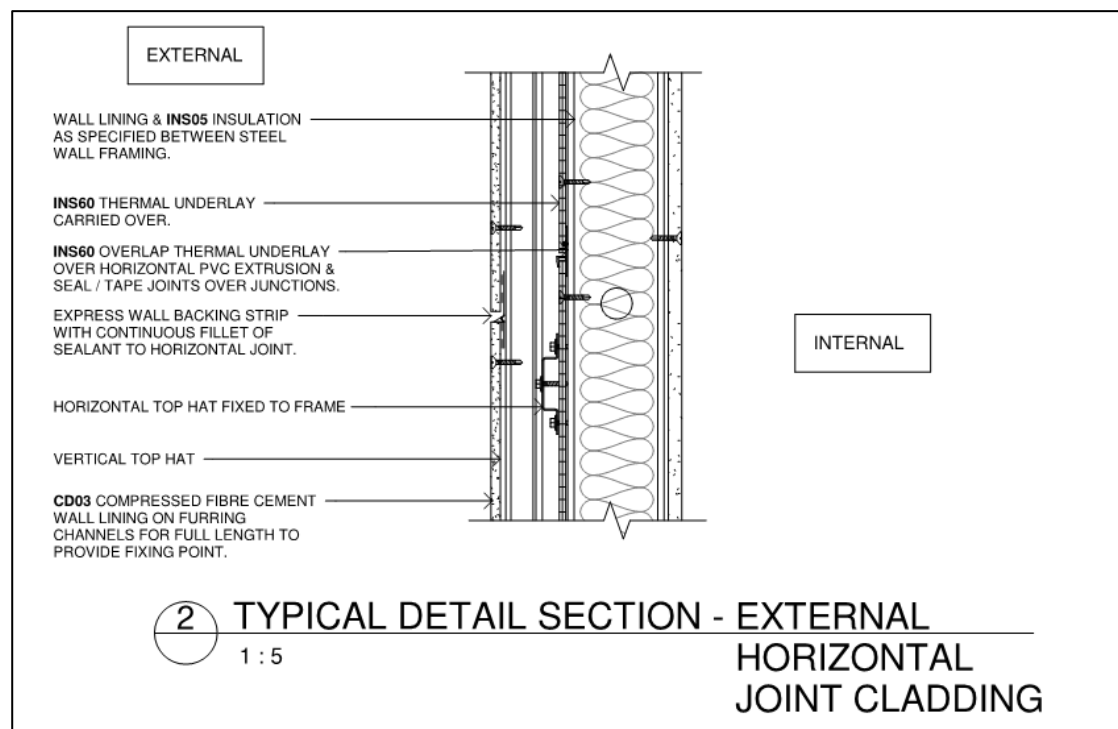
Source – Plan M-AR-DW-5103 Typical Details – Sheet 3
